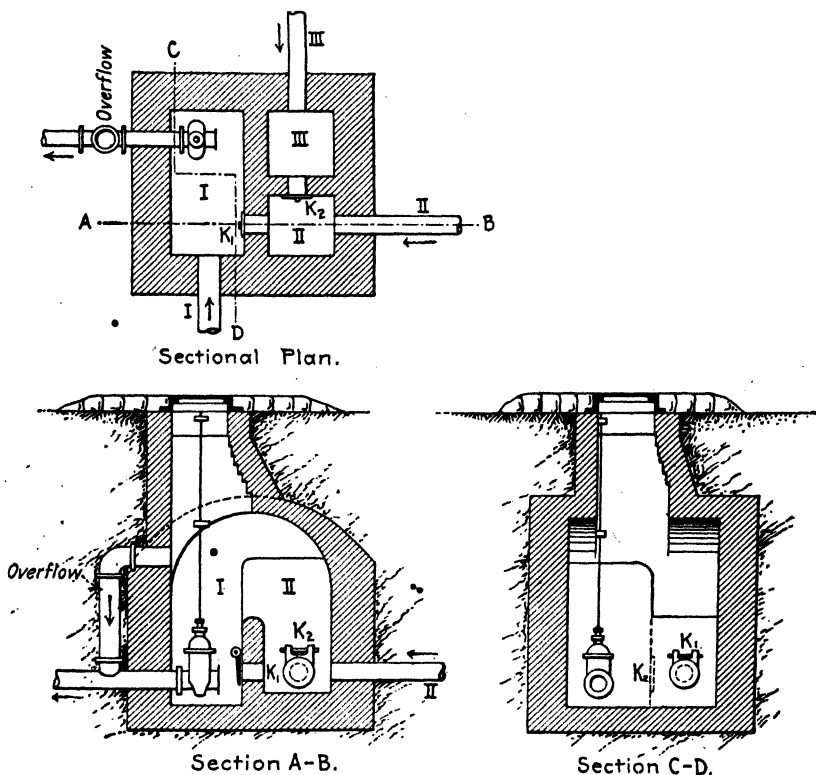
Underground collecting reservoir with flap valves.^{10a}
